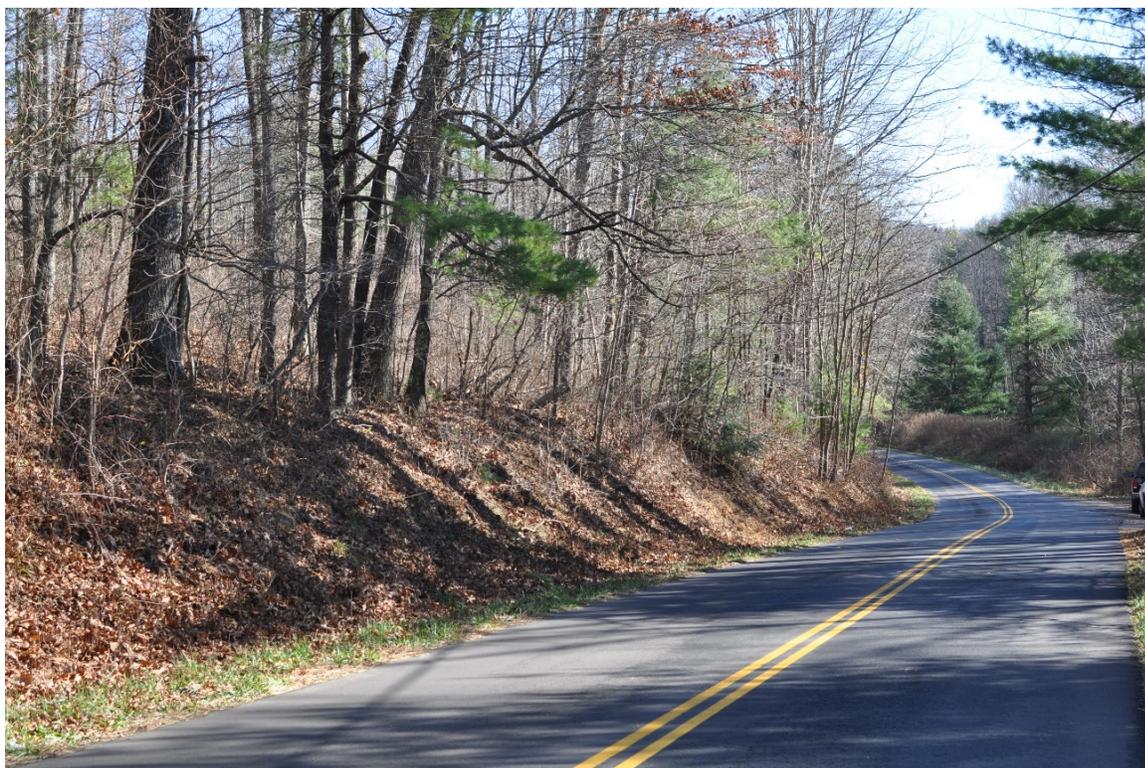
looking east along Clover Hill Road along where Alternative 2 would be located
